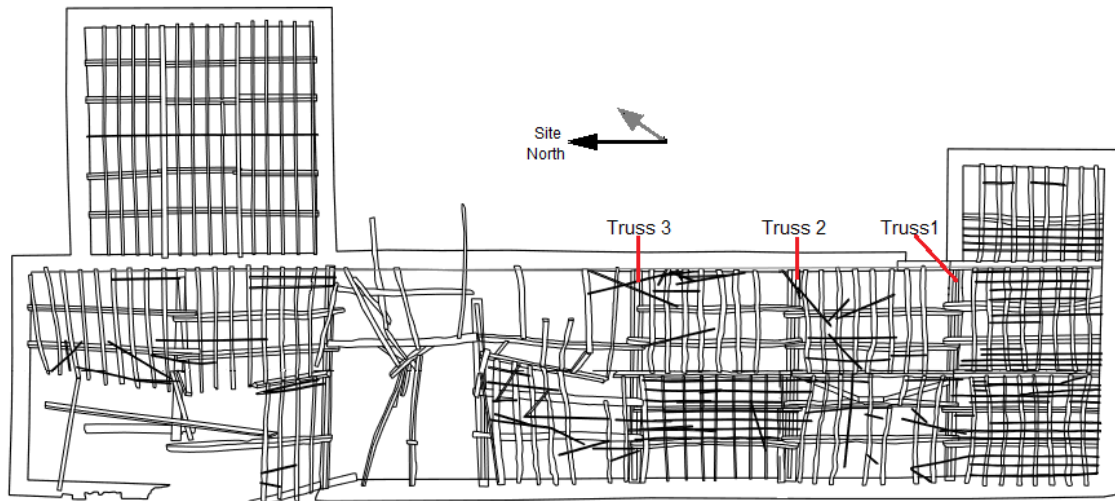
Roof plan, showing truss numbering (Archeritage for Pearce Bottomley Architects)
